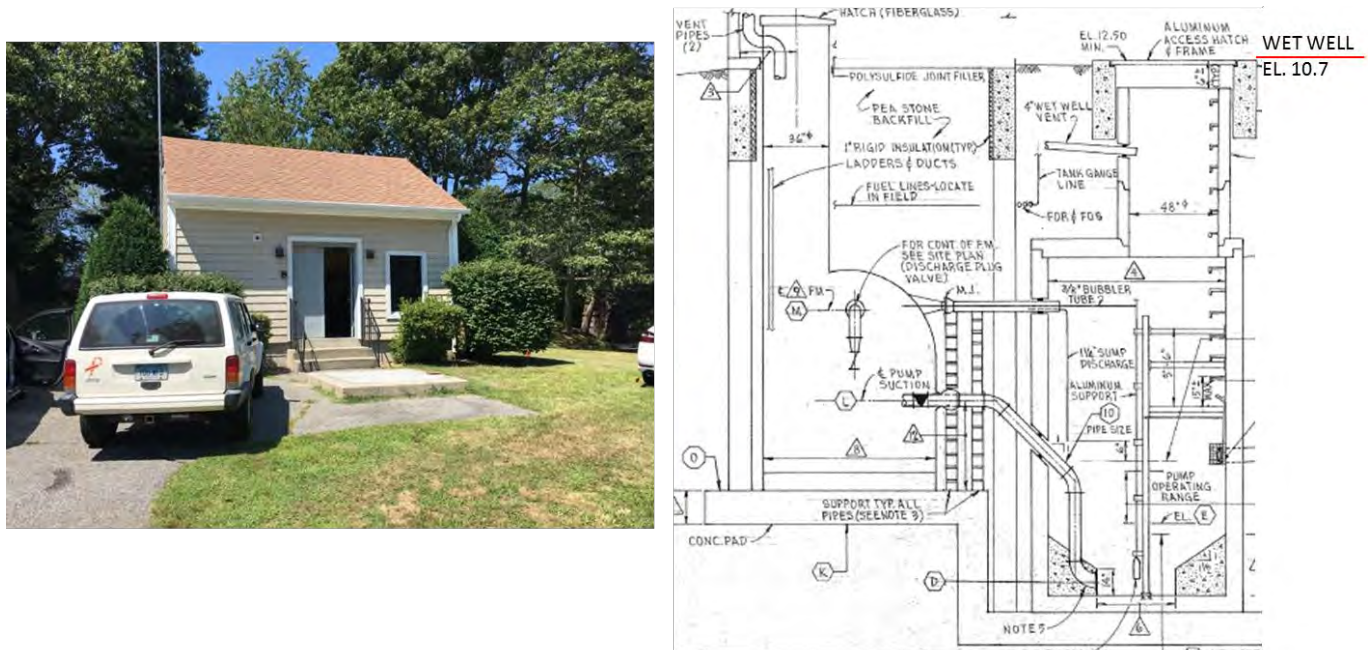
Photo and Cross-Section of Gardiners Wood Wastewater Pump Station
